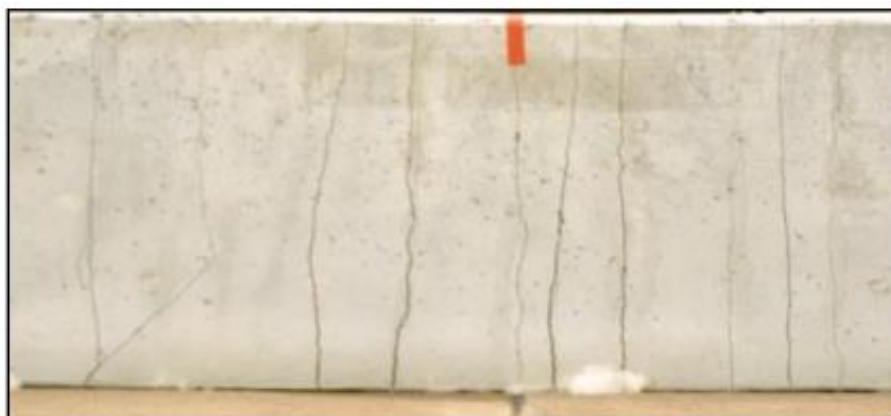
Unacceptable Barrier—Multiple Open Transverse Cracks.
